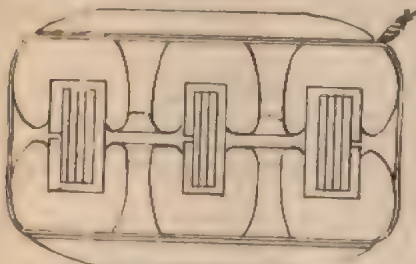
Set of Mains, with Insulators for Drawing in.
